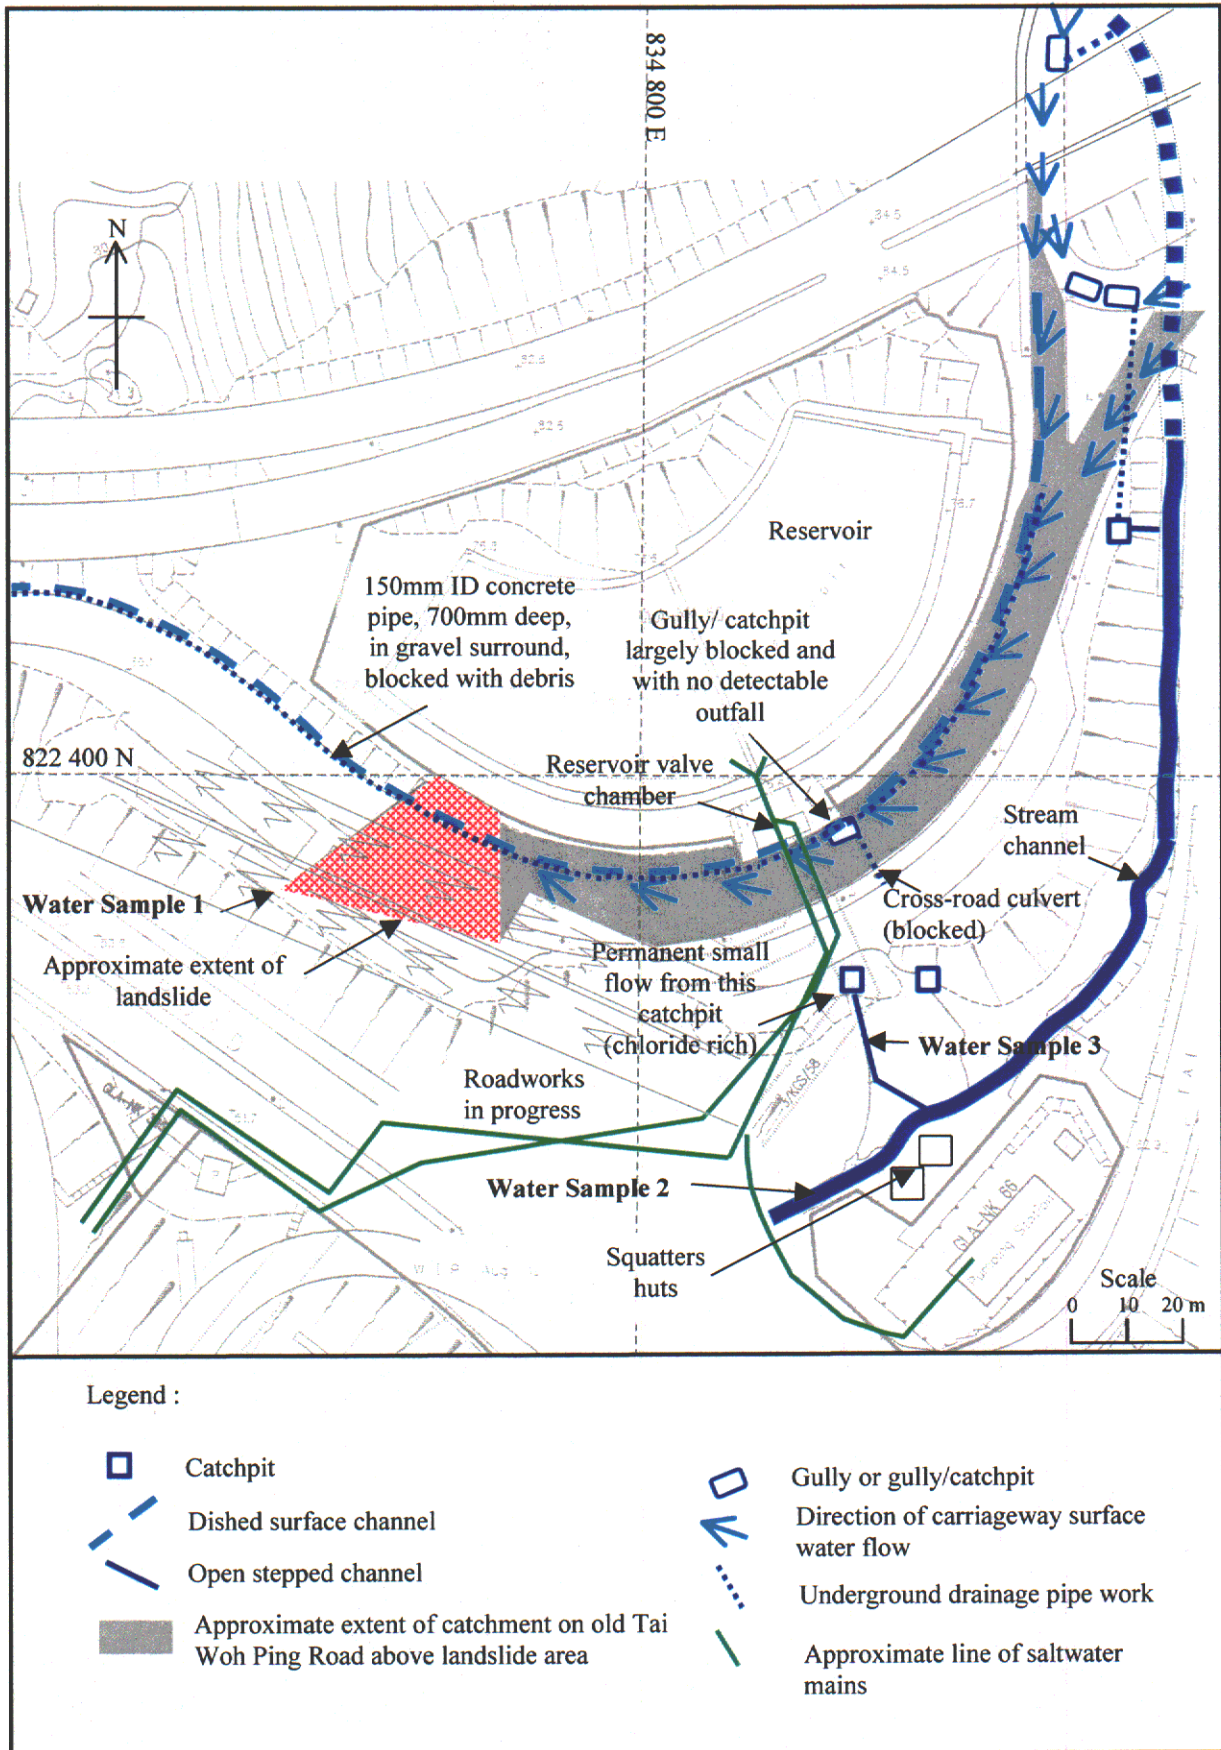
Sketch Plan Showing Surface and Underground Water-carrying Services
